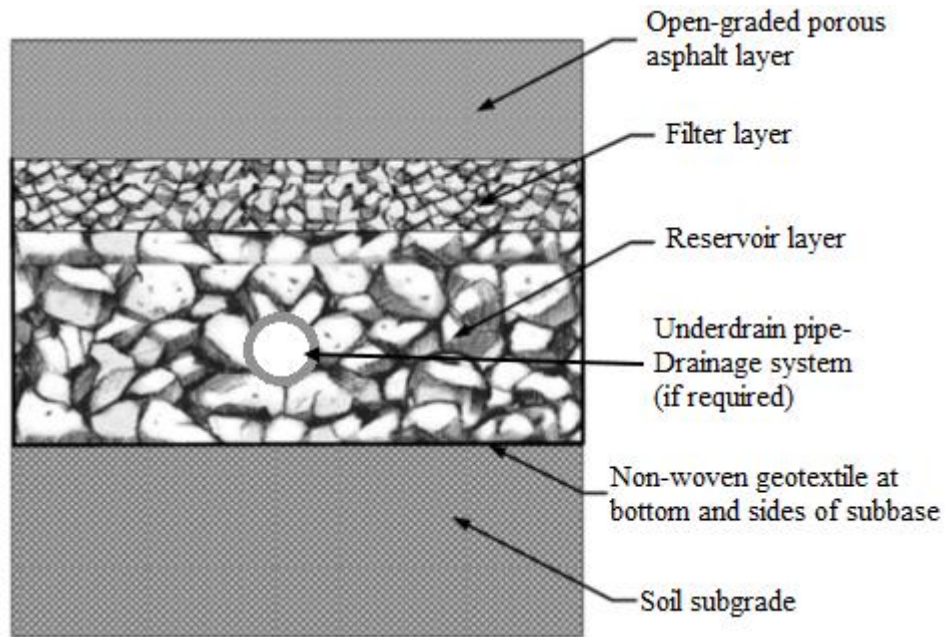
Typical cross-section for porous asphalt pavement (Iowa Stormwater Management Manual , 2009).
